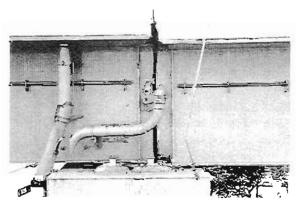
Route 2 near downtown Kobe:Large transverse displacement of deck at movement joint supported on cantilever from portal pier
